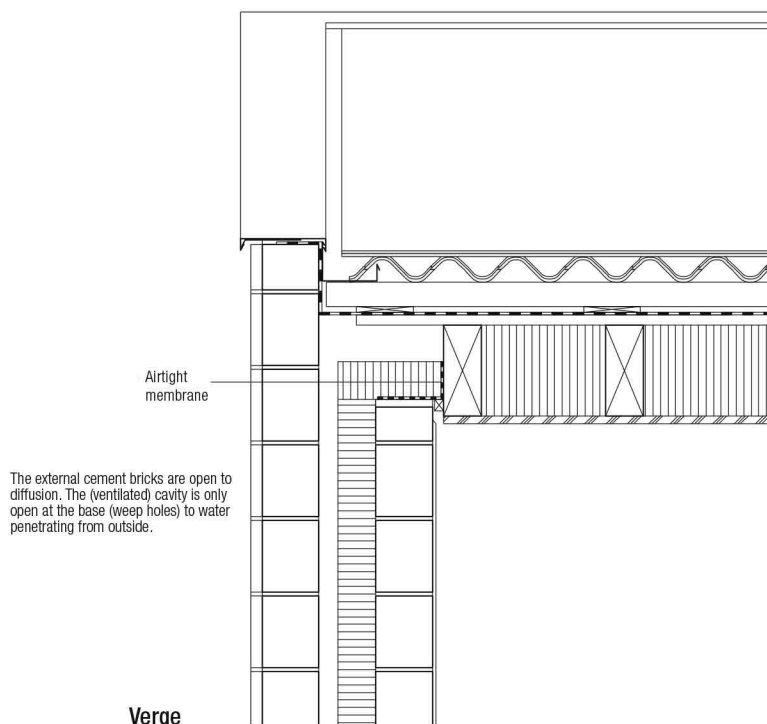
Beat Rothen: private house (Leilundgut), Uhwiesen (CH), 1997
